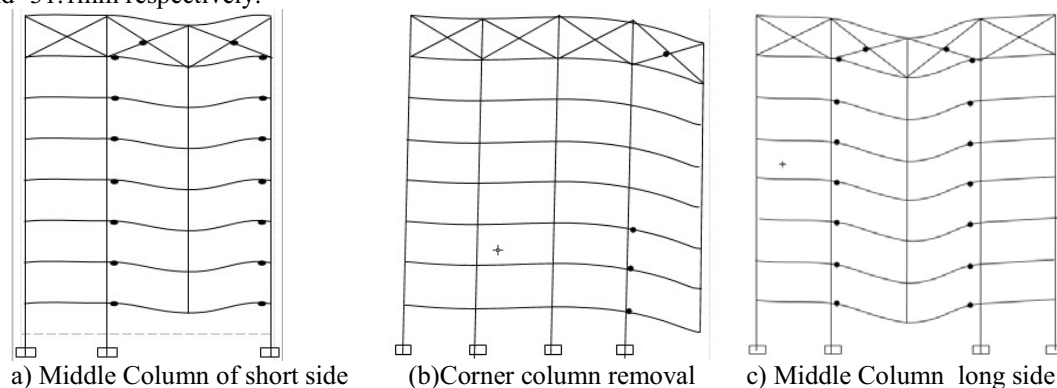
Deformed shape and plastic hinge state for the floor wise bracing system
